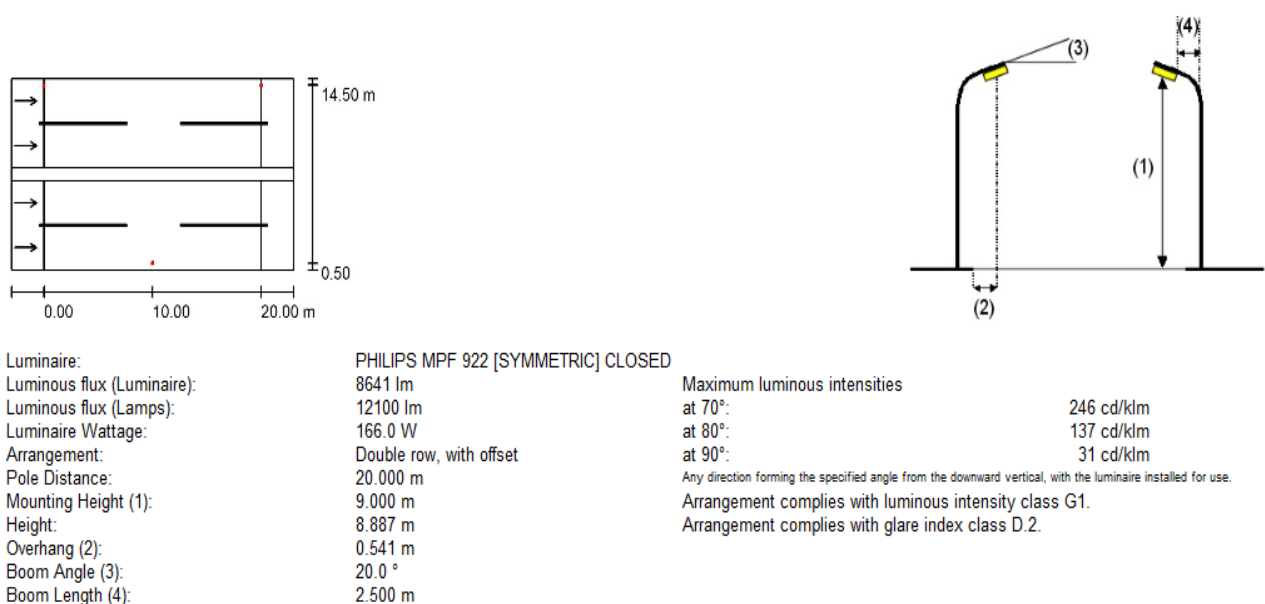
Street & Luminaire Planning Details of Plan-V
